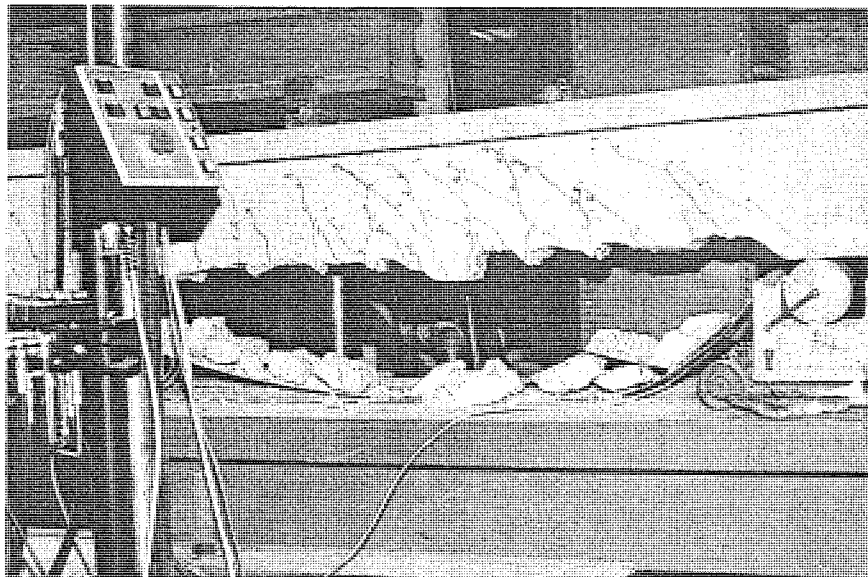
Interfacial shear failure of concrete in Beam No.8-1
